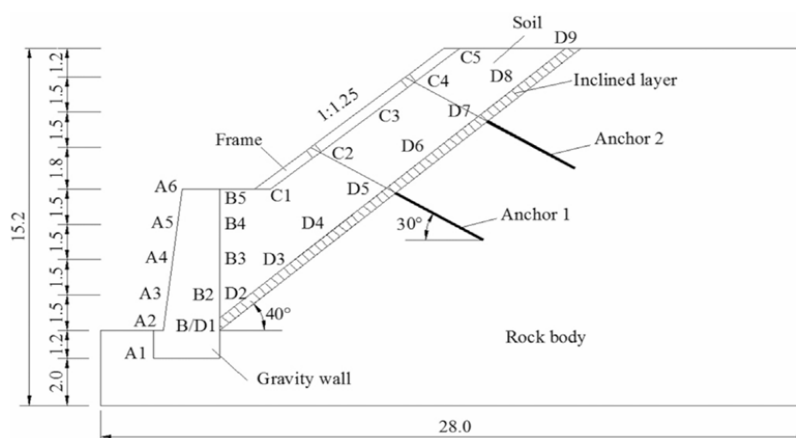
The gravity retaining wall with anchoring frame beam (unit: m) [14].
